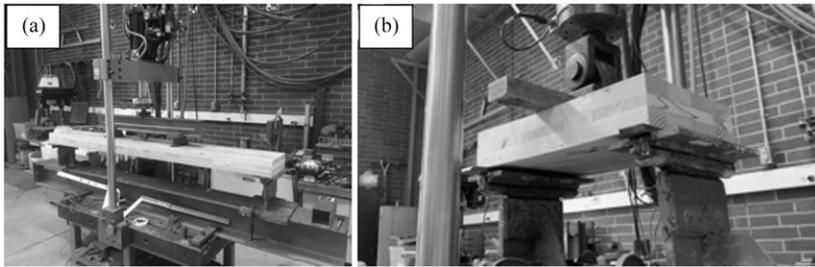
(a) Long-span third-point bending test setup and (b) short-span center-point bending test setup.
